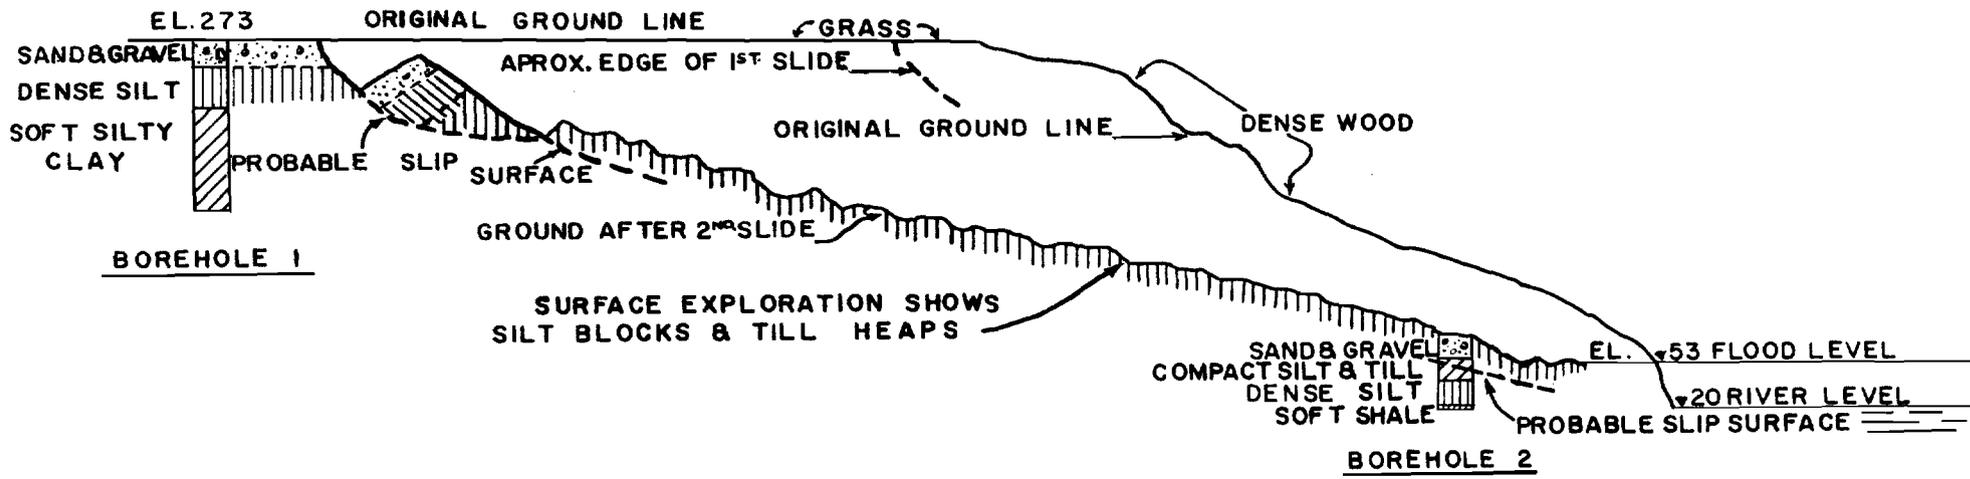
LONGITUDINAL SECTION OF EARTH FLOW
